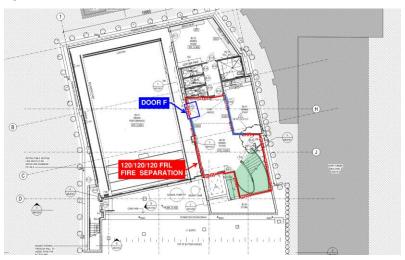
Location of Door F within Greenhalgh Centre for Music and Drama – Basement Level 2 Plan
